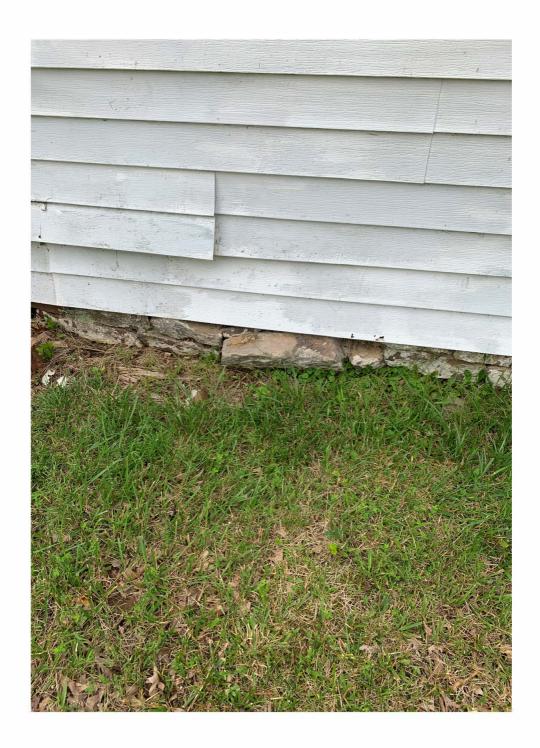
Martinsburg School - East Elevation View of Vinyl Siding - June 24, 2020
